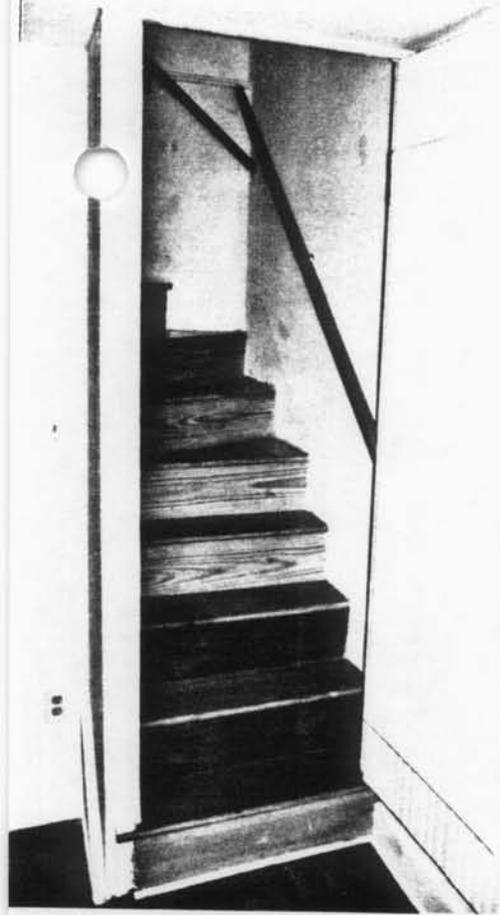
Stairs from first floor of stone house to second floor retained. A number of the treads were replaced due to damage, wear and rot. Existing door retained.
